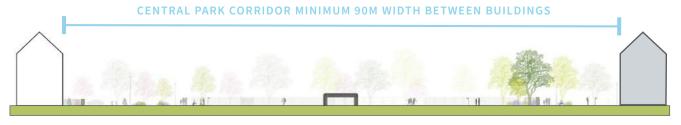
CENTRAL PARK CORRIDOR WIDTH
